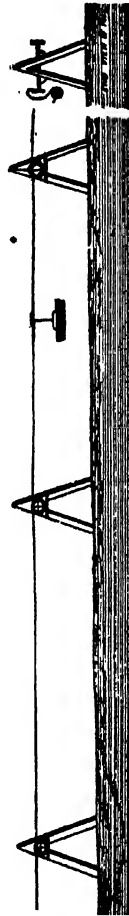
Installation on a Sugar Plantation: Portion of Line and Standard.
